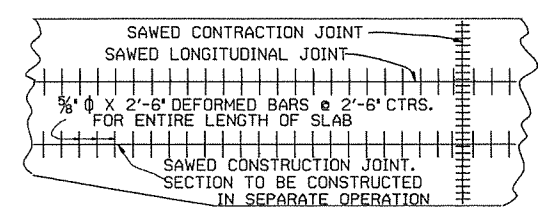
DETAIL OF SAWED LONGITUDINAL JOINT AND LONGITUDINAL CONSTRUCTION JOINT
